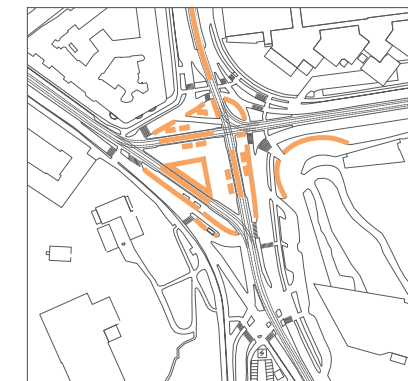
Existing project site, physical barriers (fences, walls and buildings)
